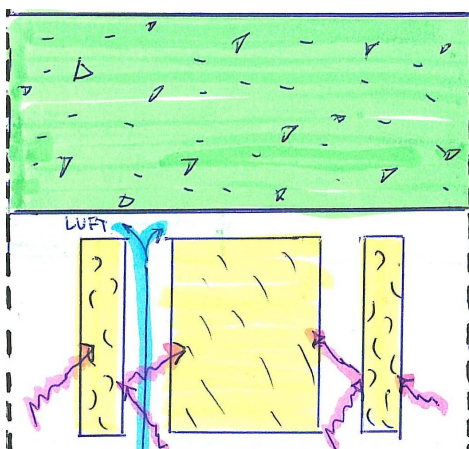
Ventilated sound absorbers (horisontally suspended ceiling)
